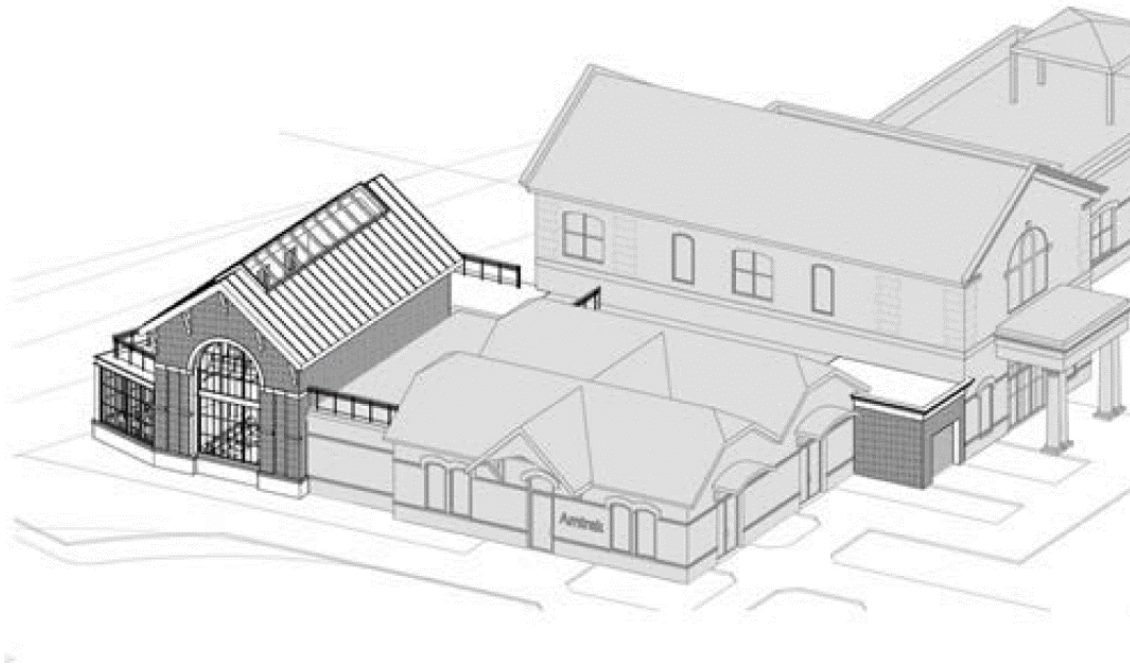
Layout of proposed addition (not including second floor waiting area).
